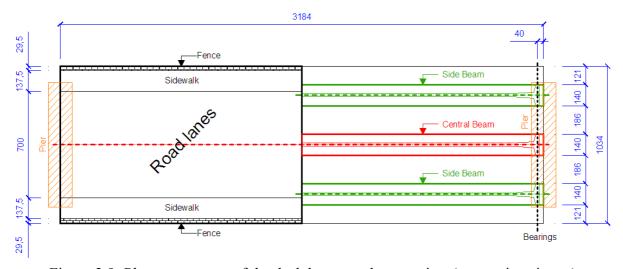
Planar geometry of the deck between the two piers (annotations in cm)
